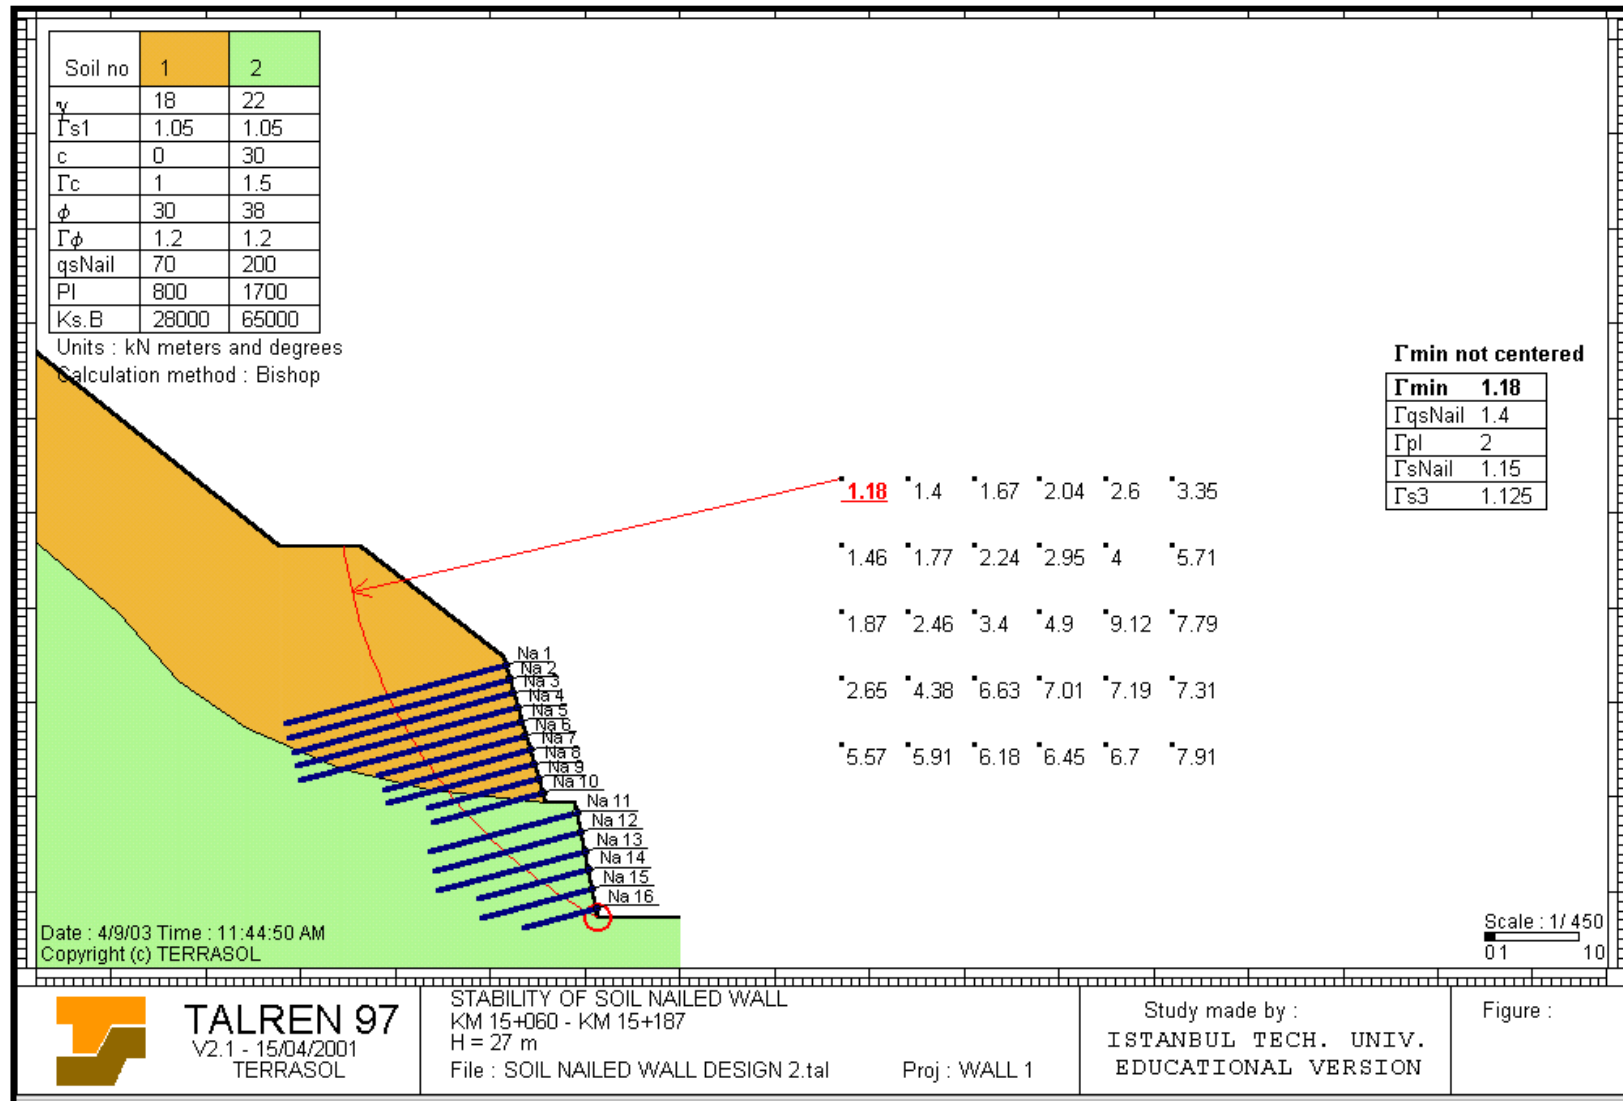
Second static design and stability analysis of the soil nailed wall with TALREN 97
